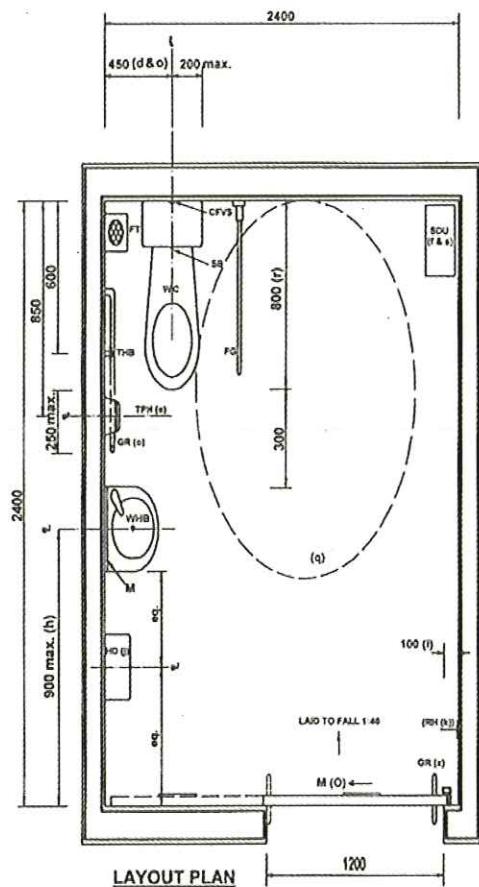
Accessible toilet unit (sliding door) - Layout plan
